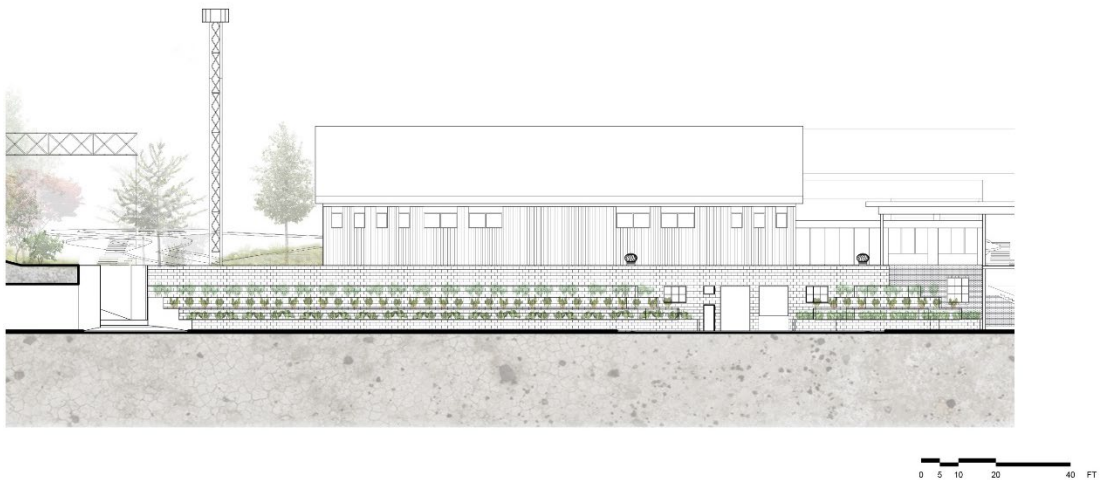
North Elevation with carved embankment edges for loading and utility access.
